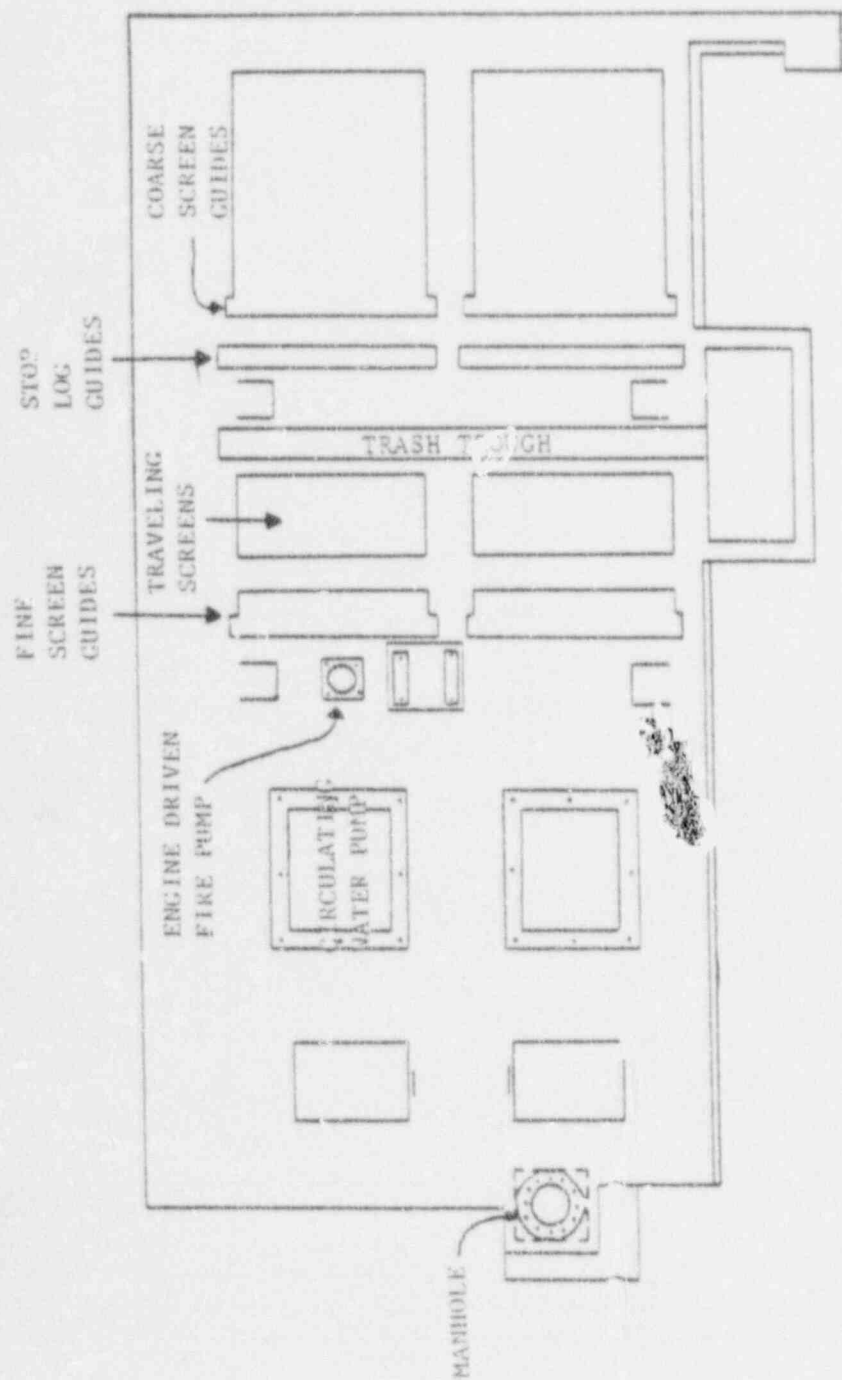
Intake structure, Unit 1, plan view
